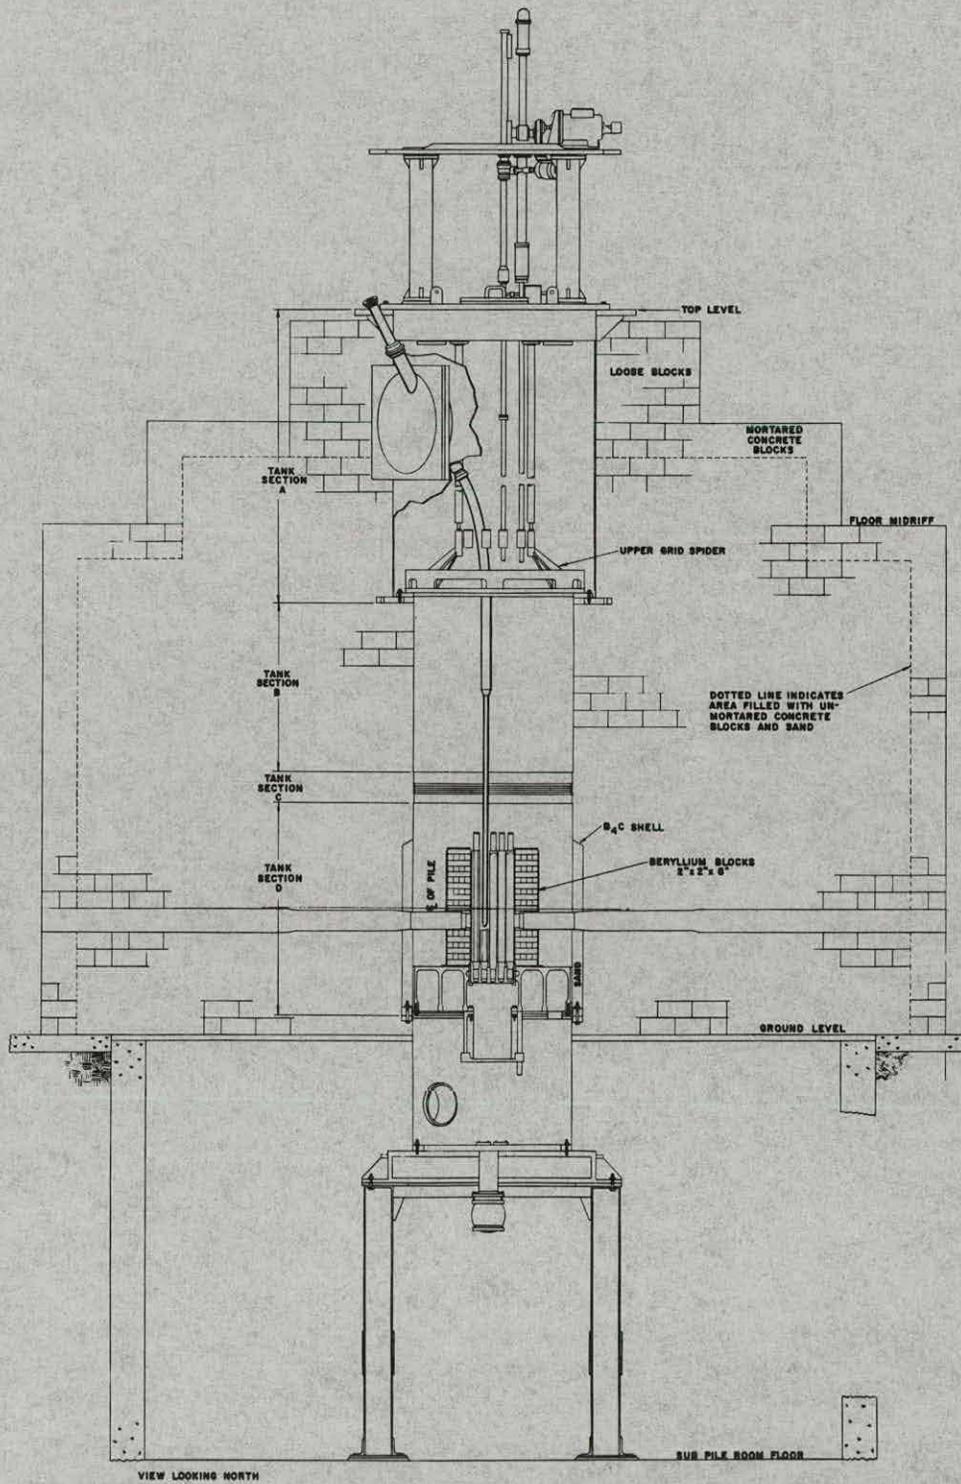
Section of LITR Showing ANP C-48 Test Facility (D.I. 244)
